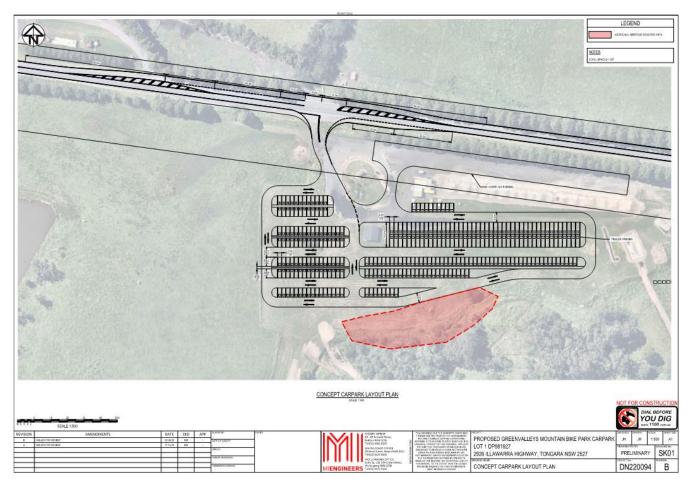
Car Parking Layout and conceptual CHR Intersection Layout
